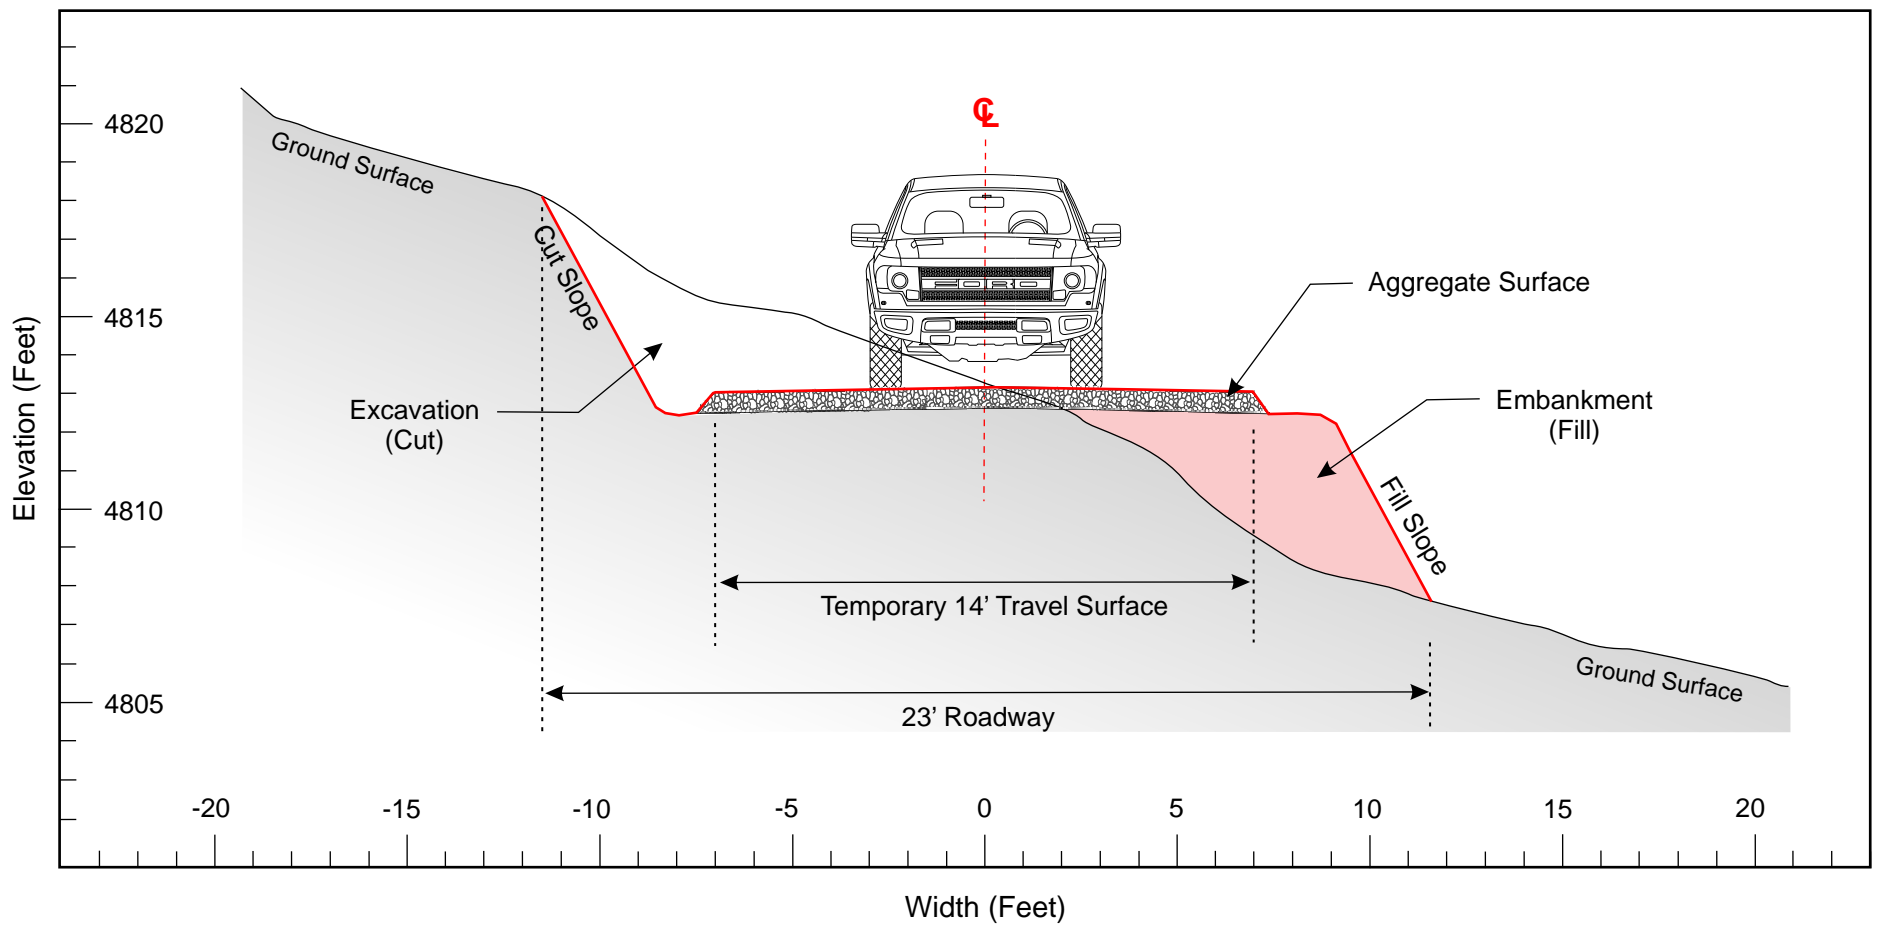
Cross-Section of Typical New Temporary Bypass Road
